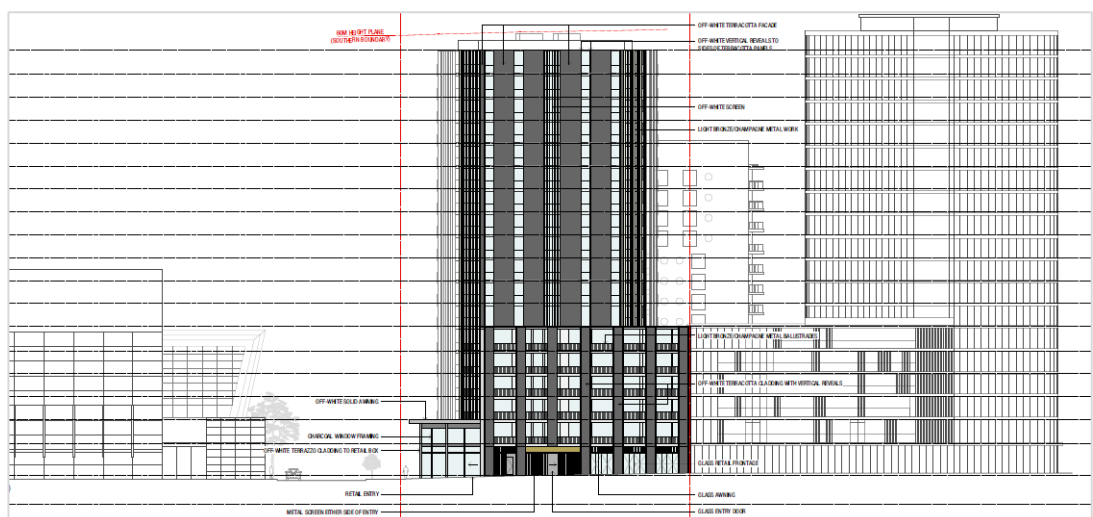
Extract of architectural plans showing proposed in context with other existing tower developments towards the southern end of Oxford Street (Source: UP Architects/Kann Finch).
